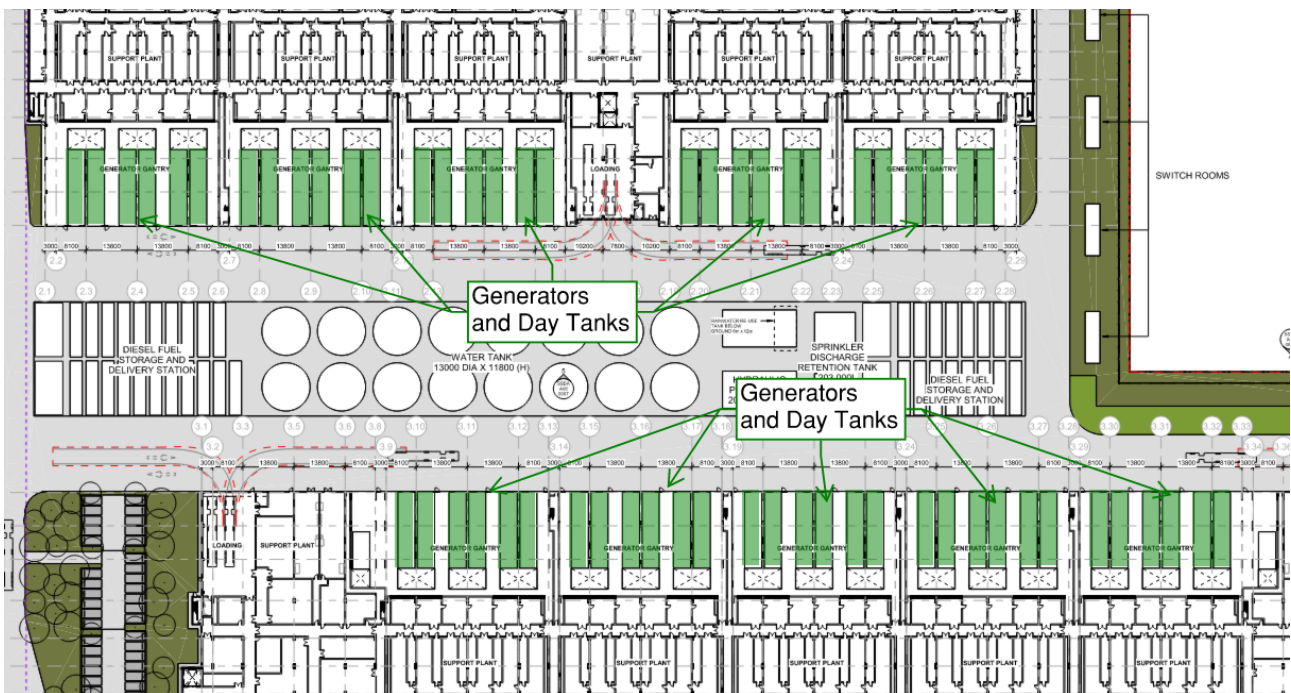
Location of Generators and Day Tanks (Ground Floor)
